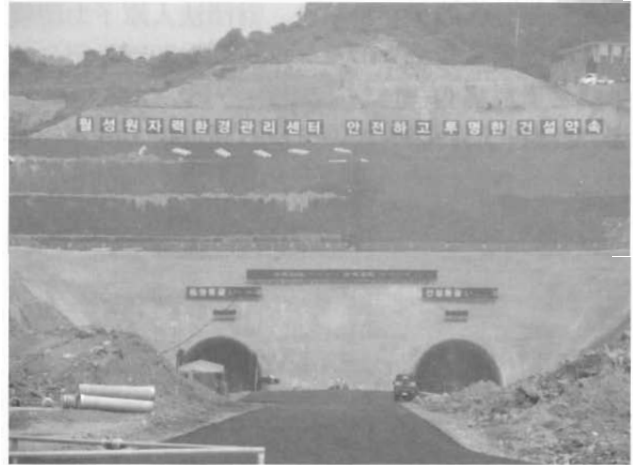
Entrance of Construction Tunnel and Operation Tunnel under Construction
